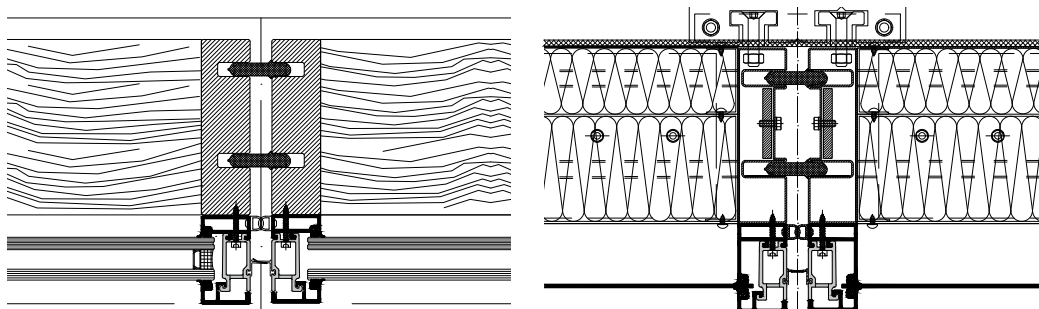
Type 2 horizontal detail spandrel area and vision area n.t.s. (source: own image)
